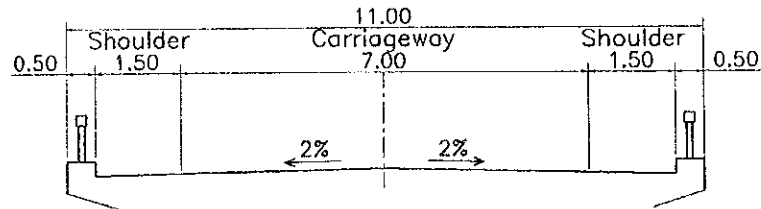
STANDARD CROSS-SECTION OF BRIDGE
